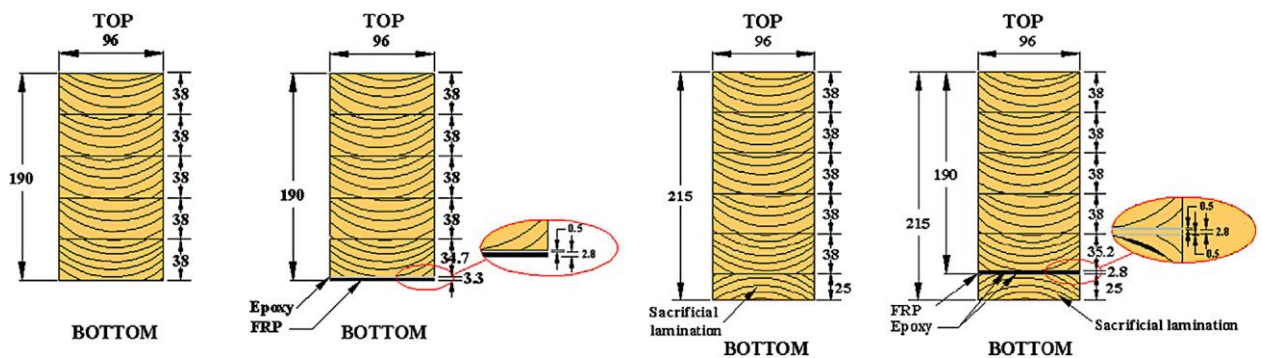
Reinforcement schemes studied by (Raftery and Harte 2011).
